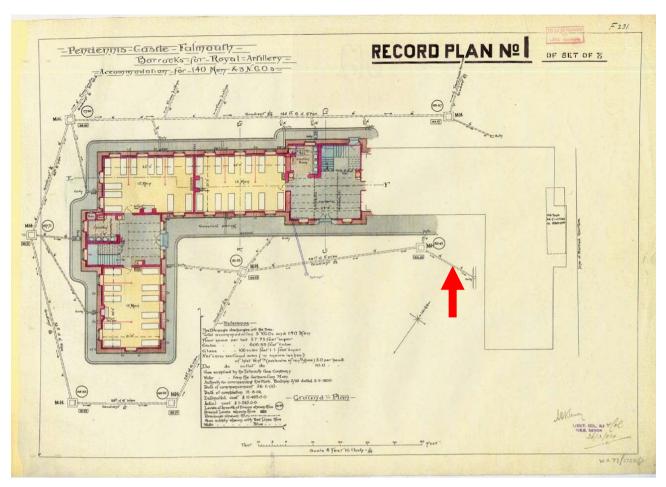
Plan of Pendennis Castle barracks and associated drainage 1904 (PRO WO78/2757). Red arrow shows pipeline encountered in Trench 1.
